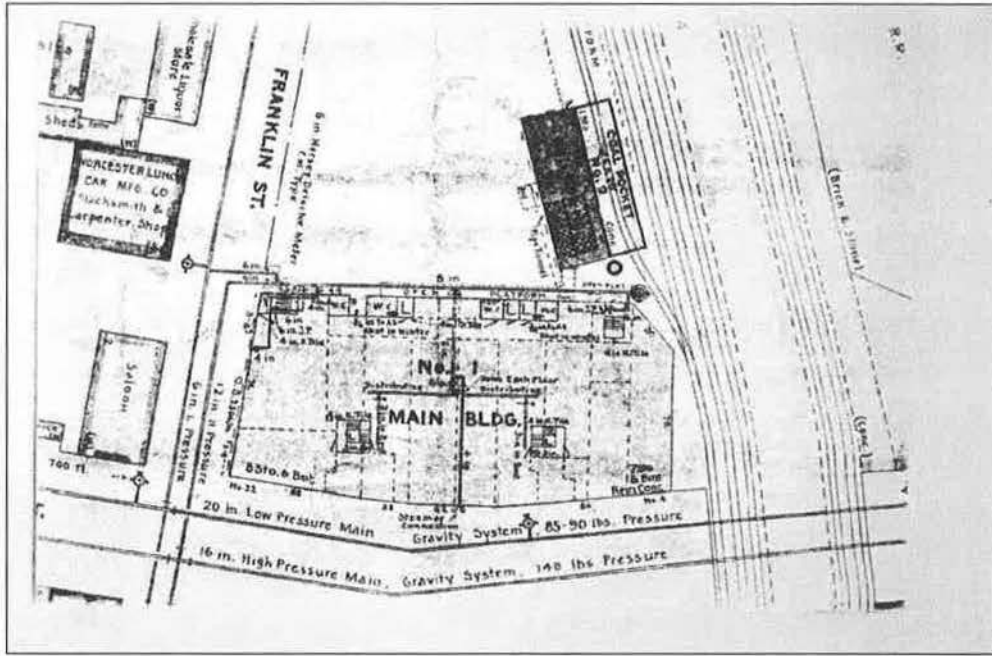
Original site plan for the Osgood Bradley Building (ca. 1914; image found in the archives of the Osgood Bradley Building, courtesy of Brad Wyatt)
